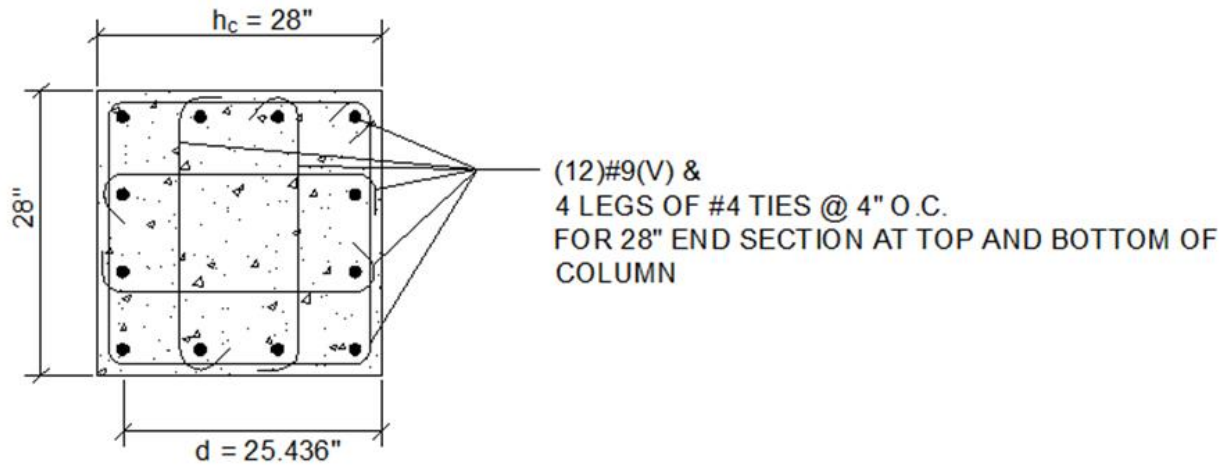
Exterior column, cross section at end of column at the 4th floor level based on tsunami design requirements.
